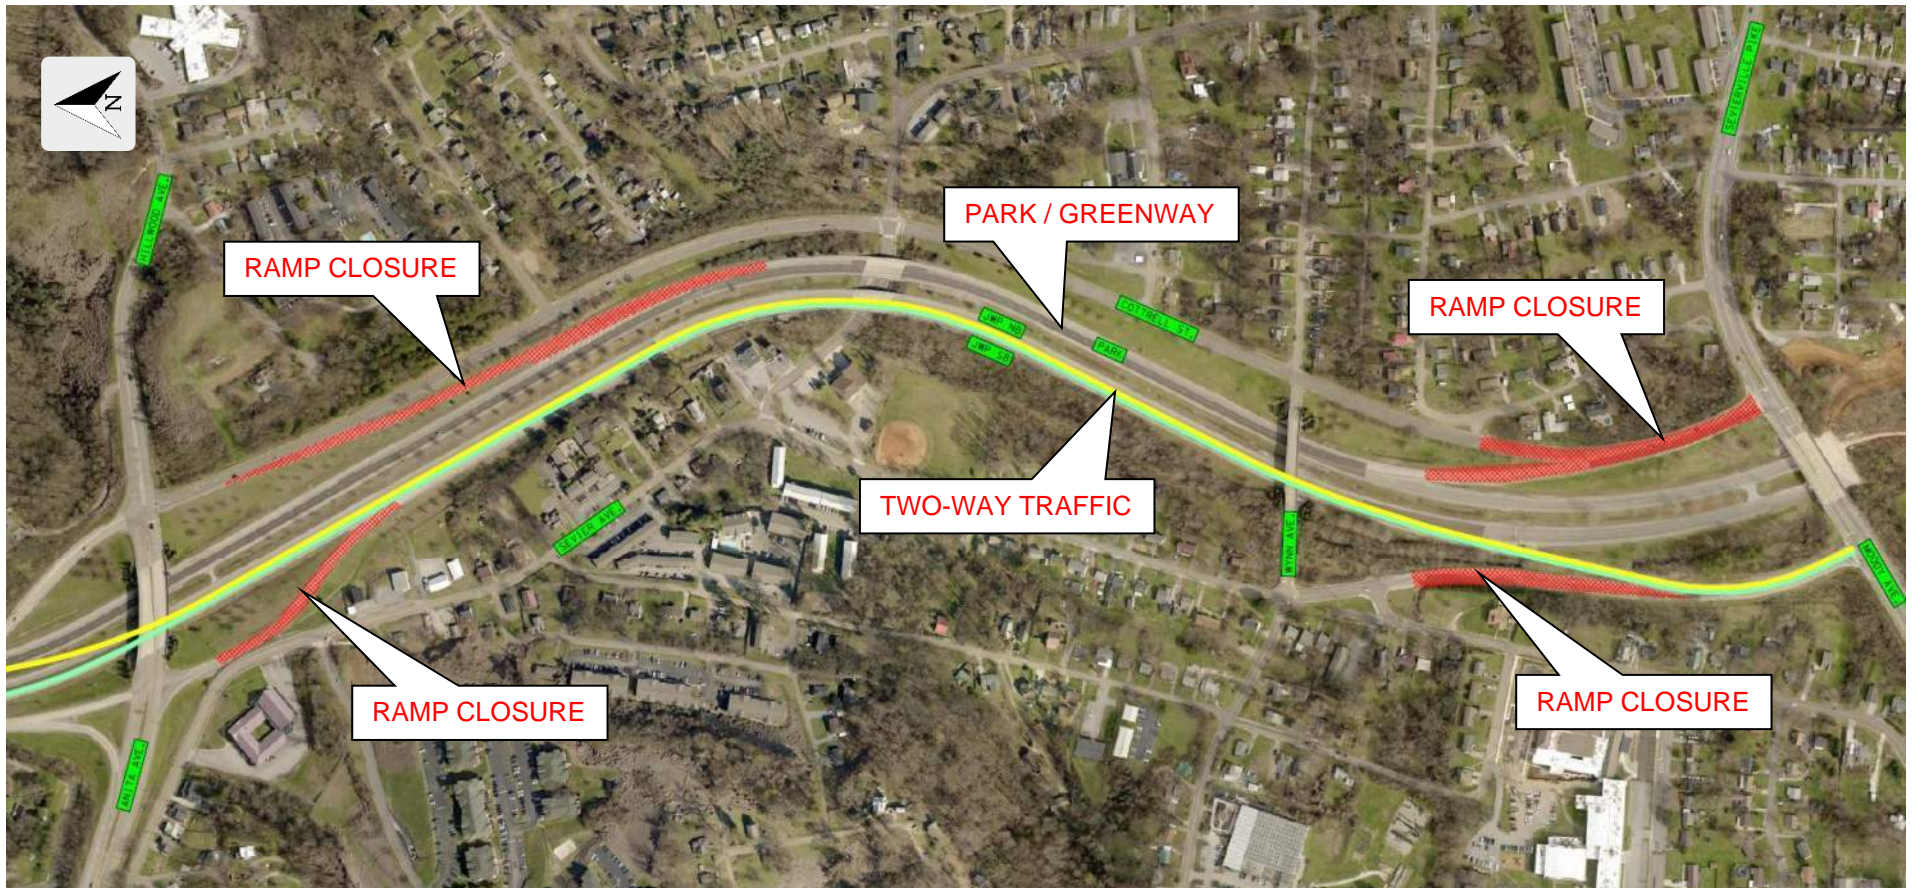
BUILD ALTERNATIVE SINGLE-LINE SKETCH
